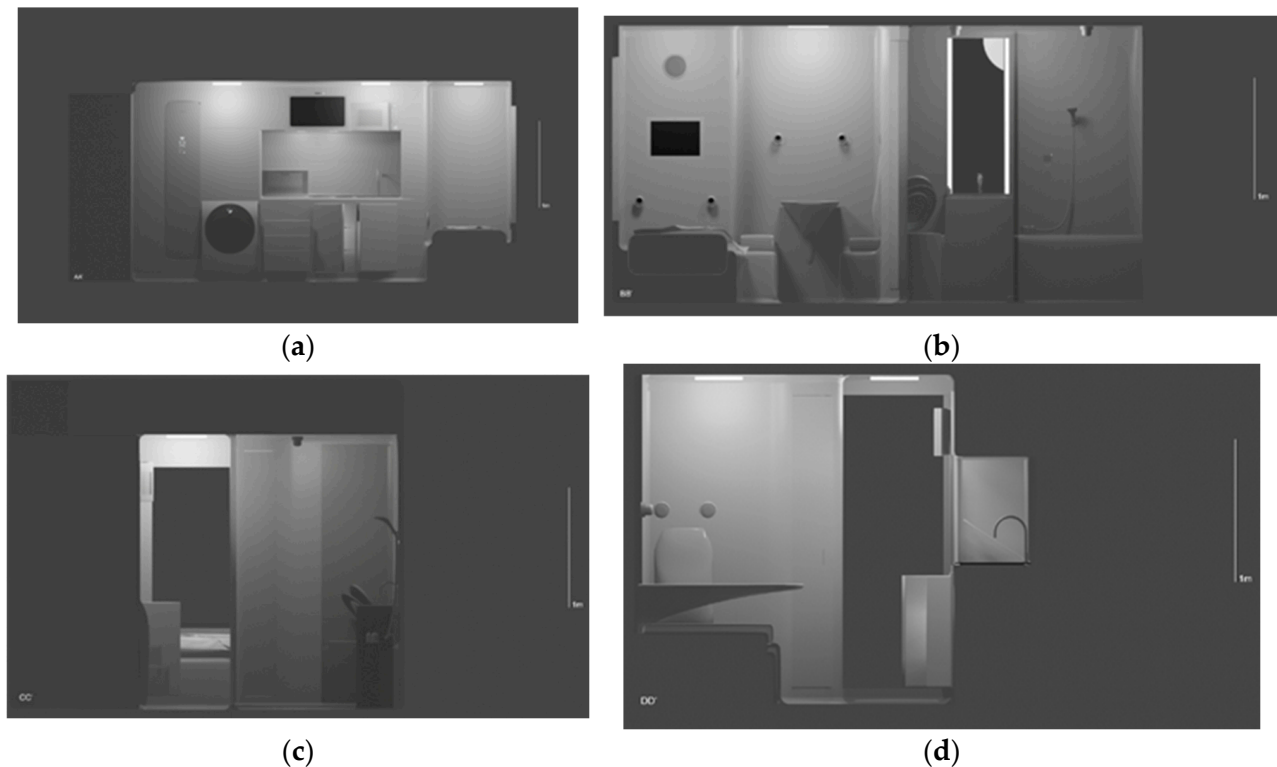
Cross sections located in Figure 5: (a) cross section AA'; (b) cross section BB'; (c) cross section CC' and (d) cross section DD'. Source: first author.
